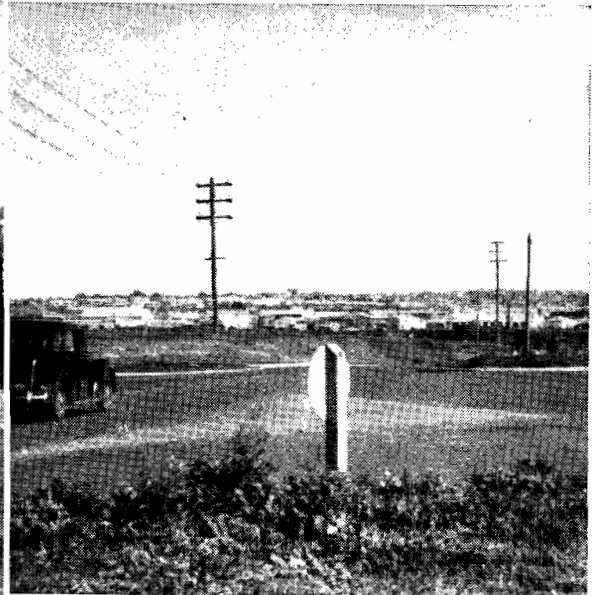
New approach to bridge over Darebin Creek in Bell Street.
